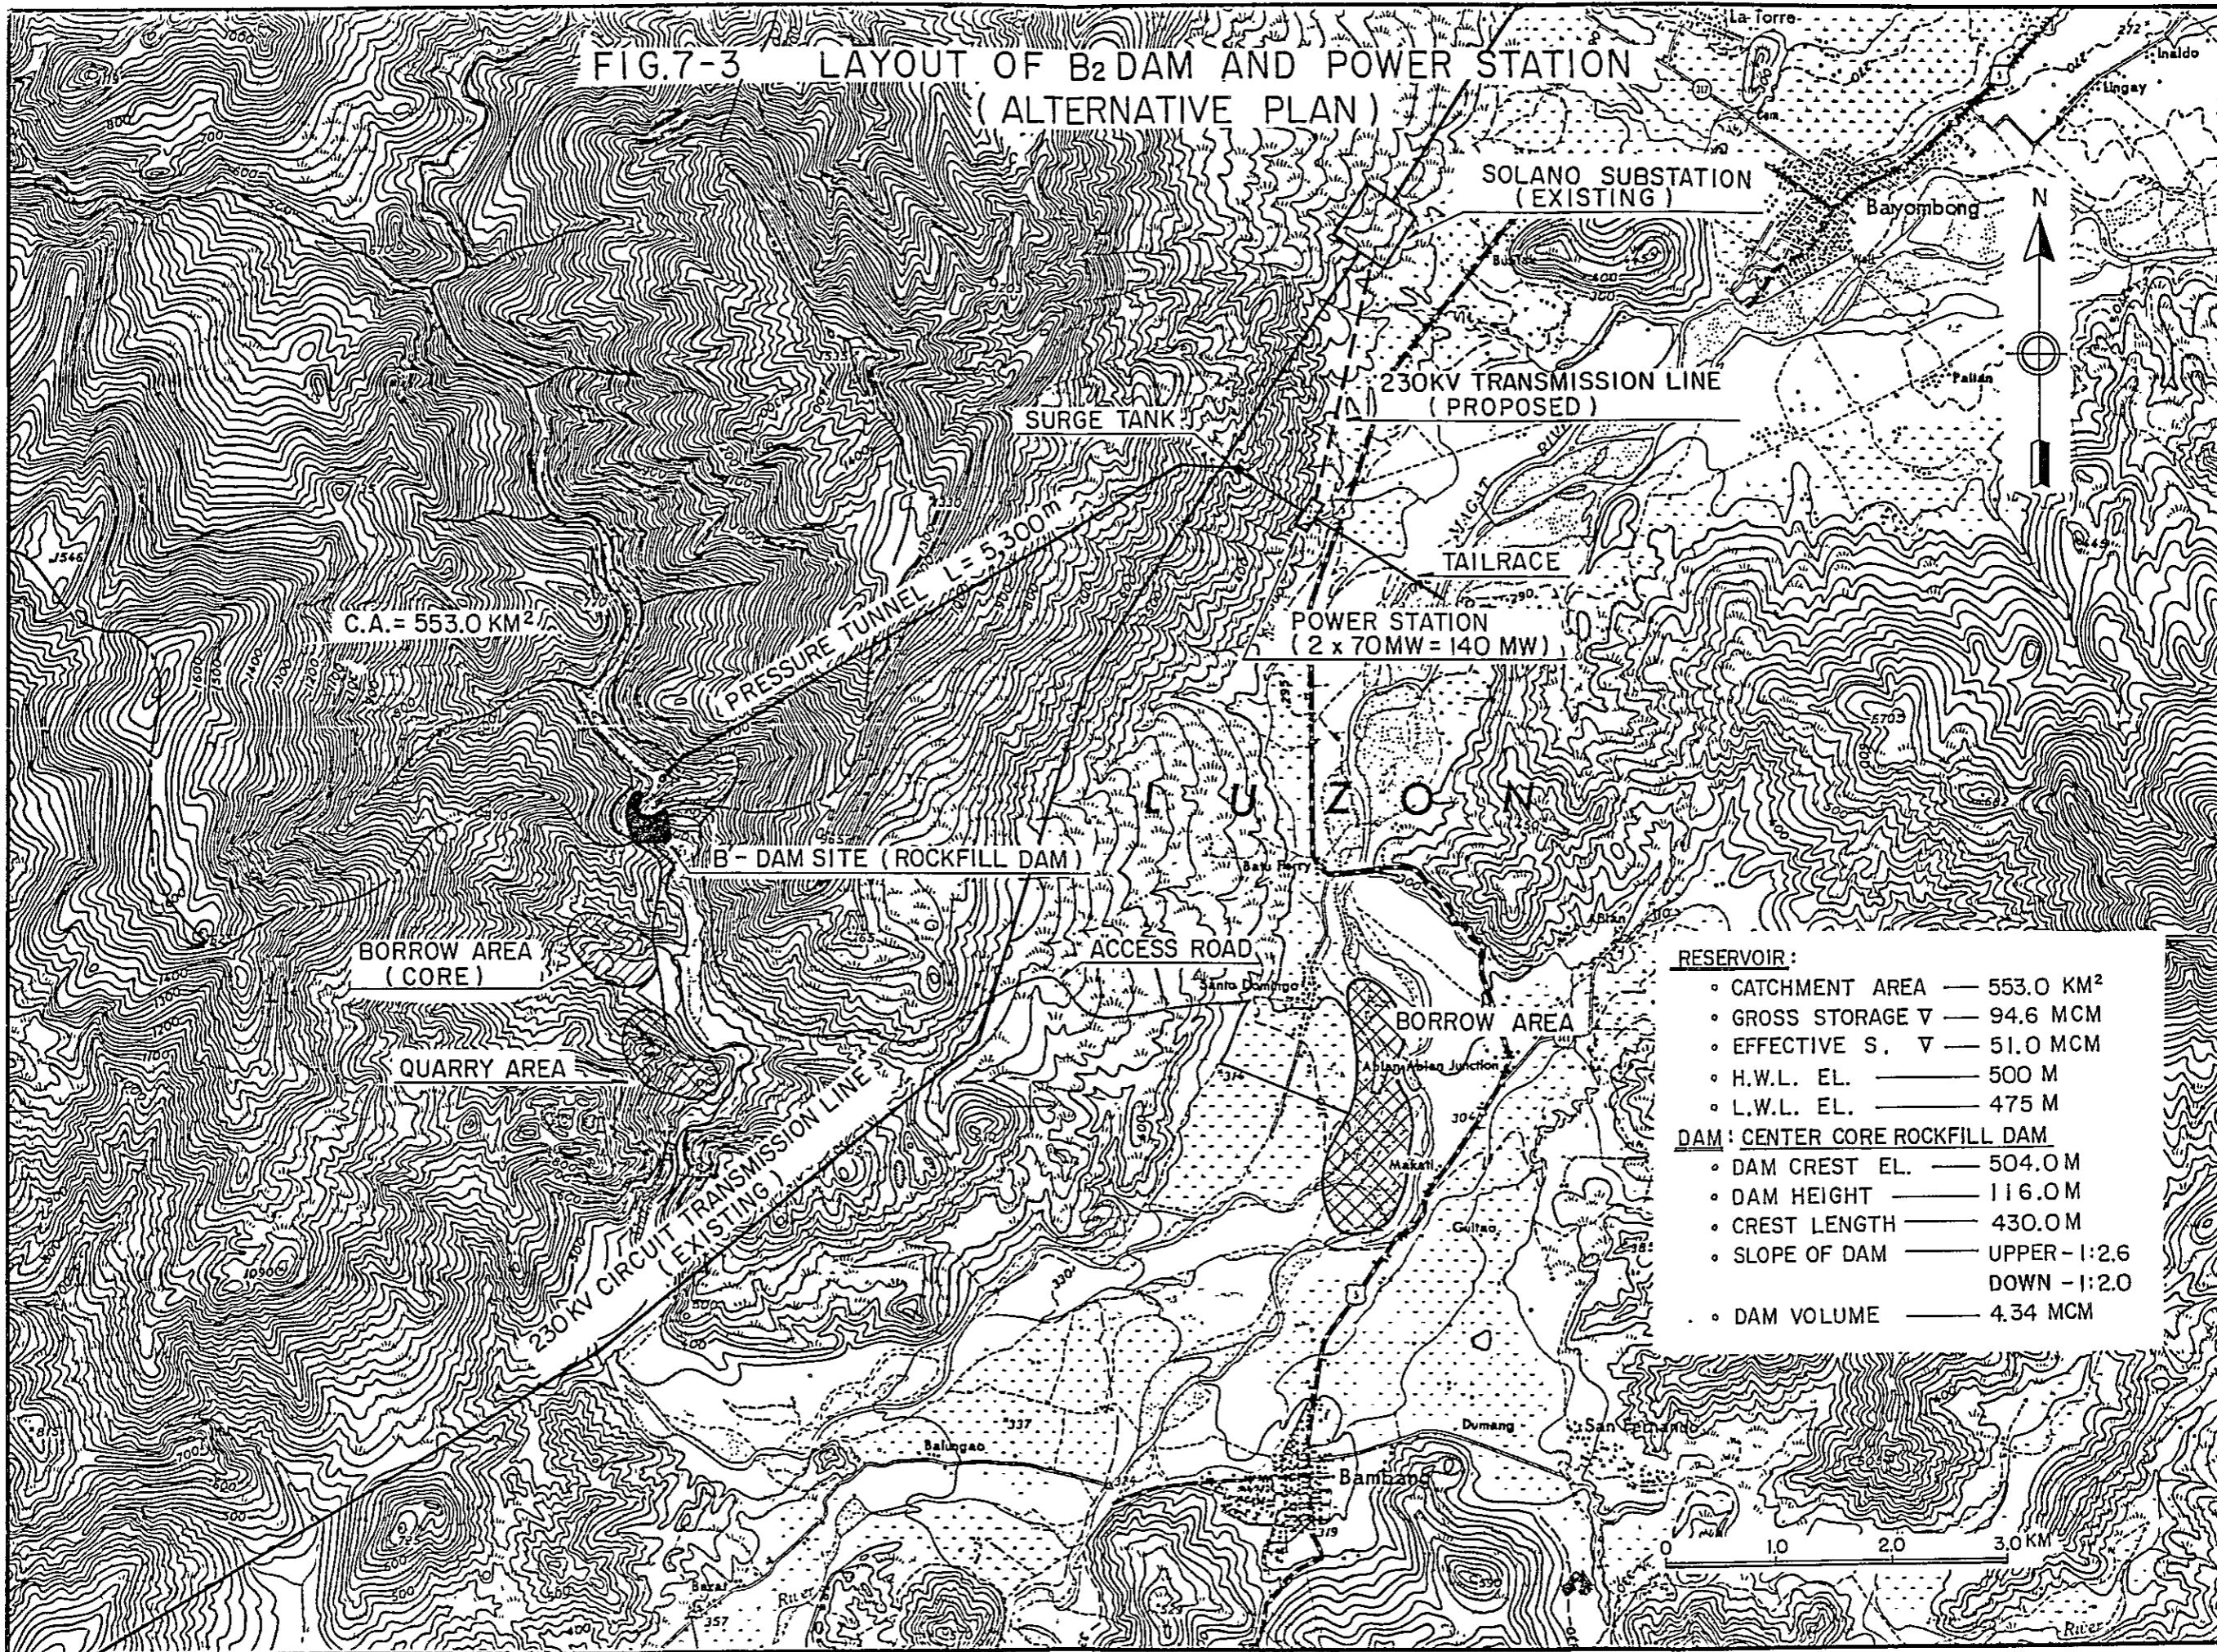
LAYOUT OF B₂ DAM AND POWER STATION
